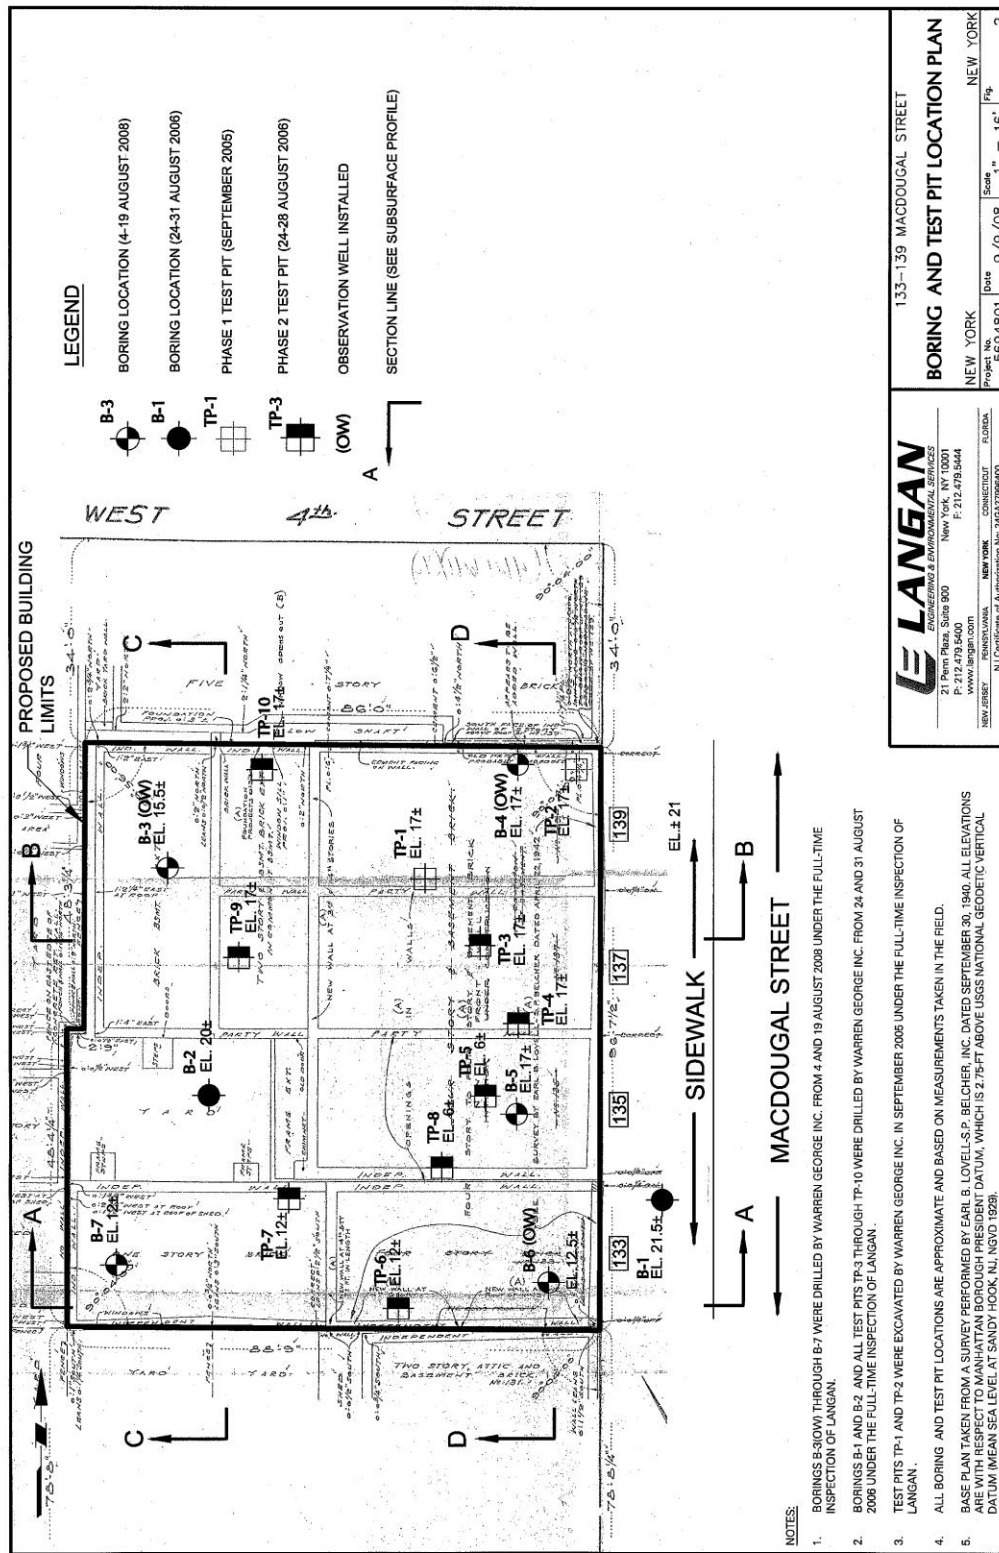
Shows Boring Cores and Test Pits Used to Determine Foundation Types
